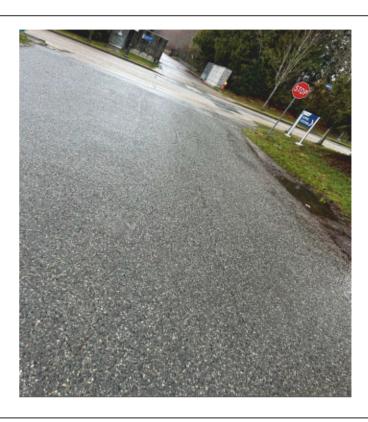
Alligator cracking in southbound lane of Nurseries Road, at the north end
